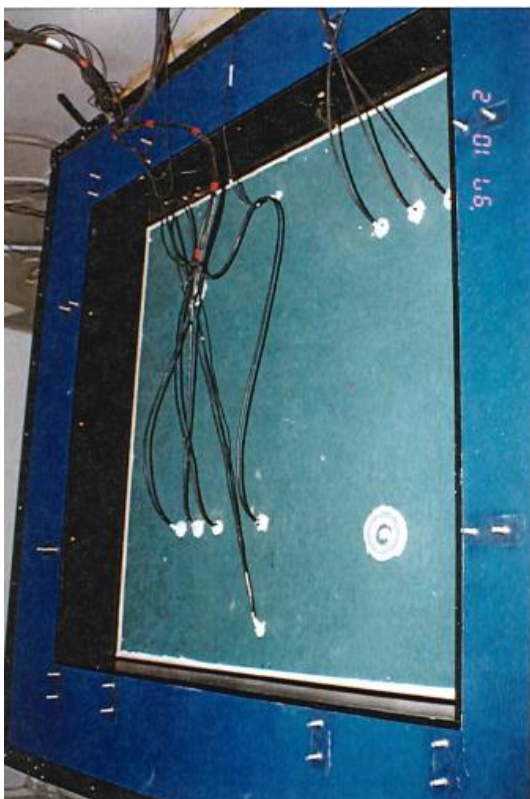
(left) Test wall was installed in the opening and the edges were sealed.
